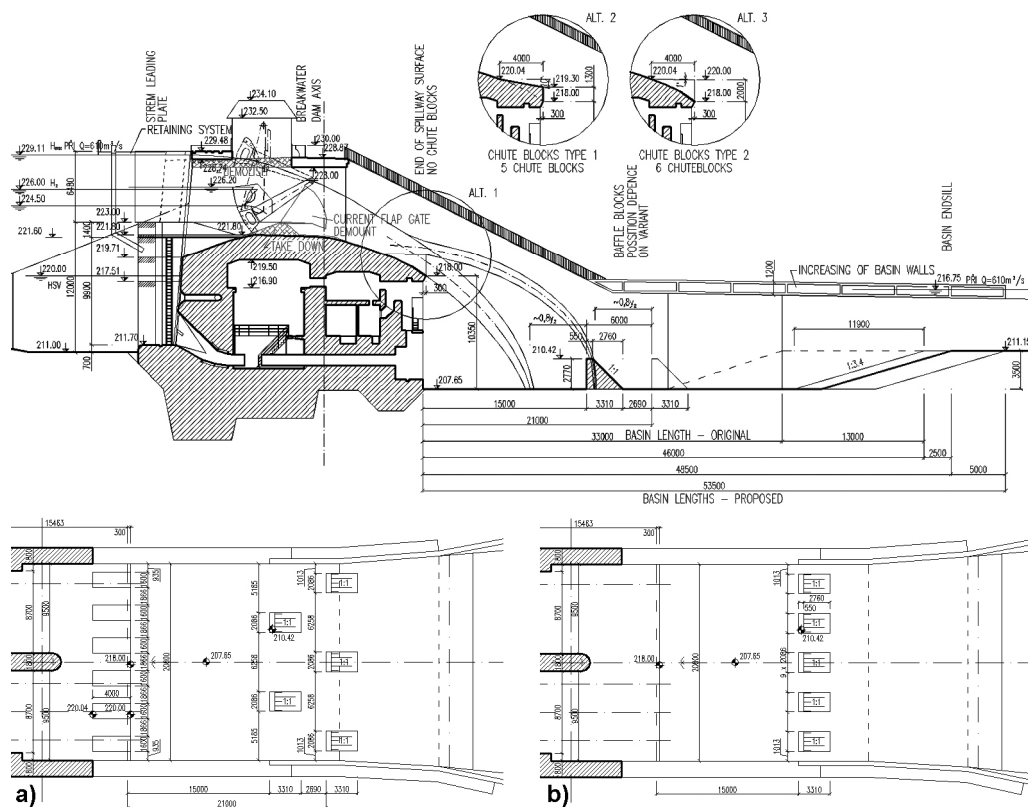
Vertical plane section of operational structure and the possible modifications and ground plan of optimal layout of baffle blocks: a) with chute blocks used; b) with no chute blocks used
